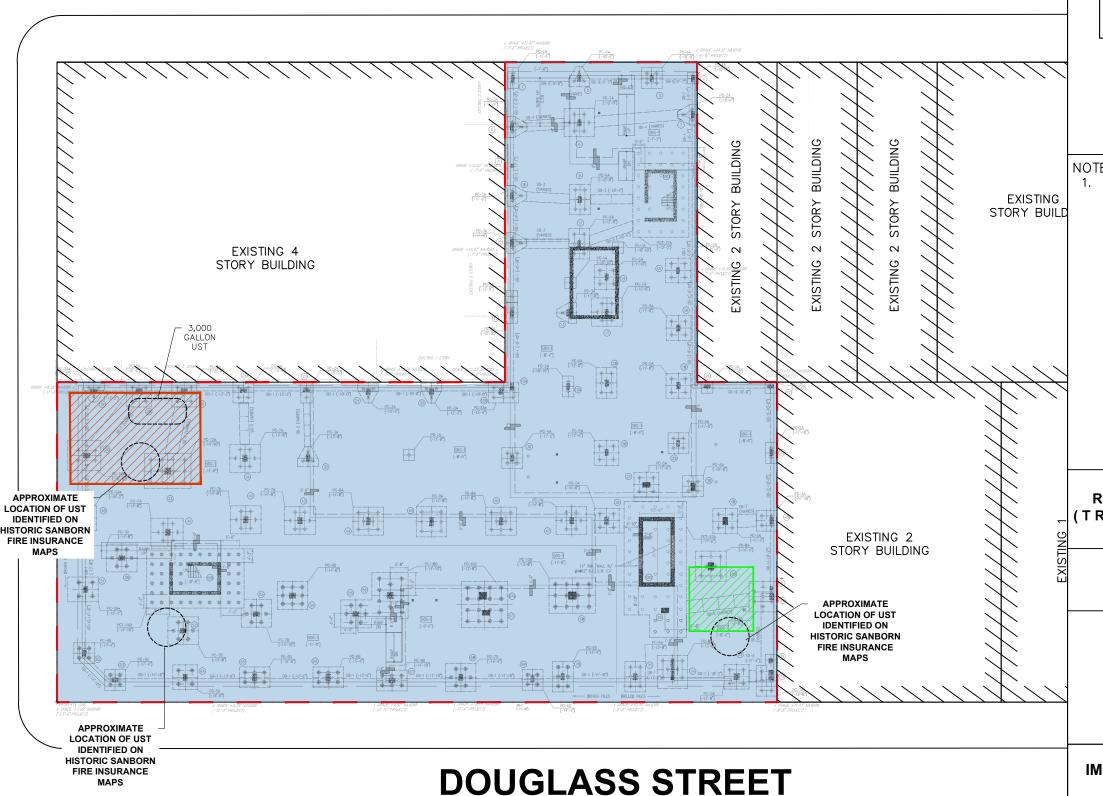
REMEDIAL EXCAVATION (TRACK 4) WITH HOTSPOTS
